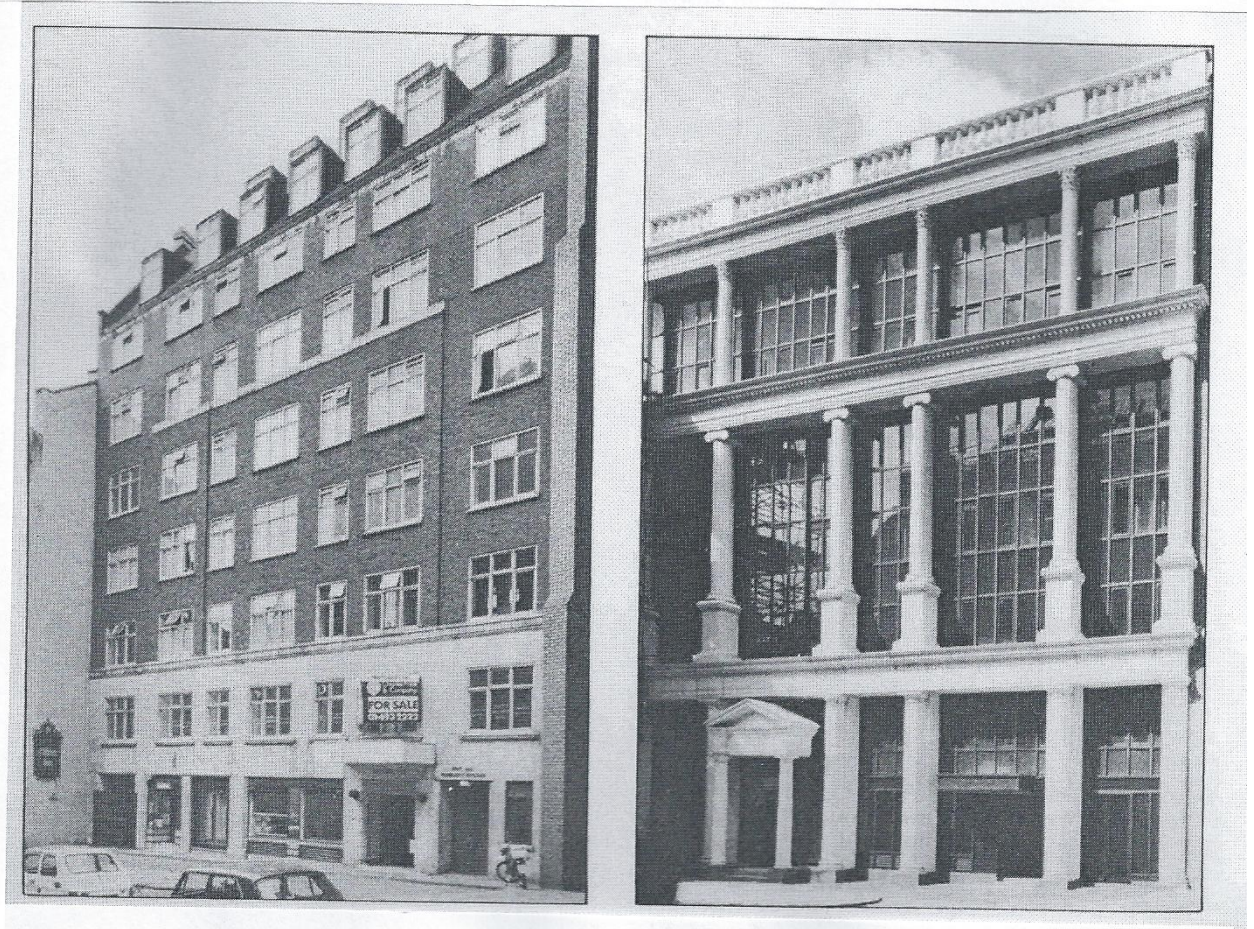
Clifford's Inn (left) the original 1930s facade and (right) the new facade set in front of a curtain wall of dark bronze anodised aluminium and tinted glass, covering the ground floor to floor 6.
